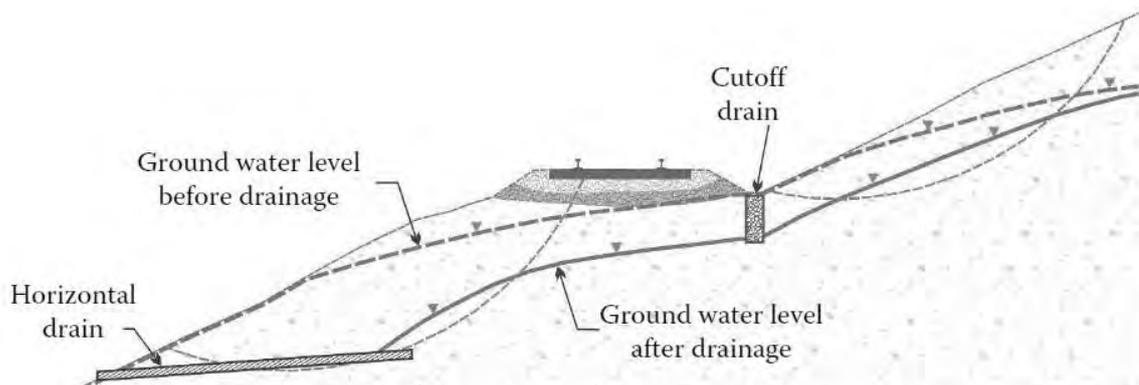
Example of track drainage lowering the existing water table, source Li *et al.* (2015)
